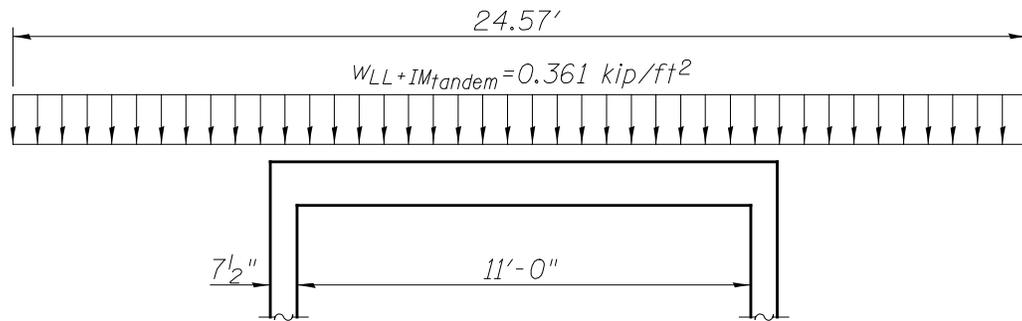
Worked Example 5 – Tandem Load (2 Lane)
